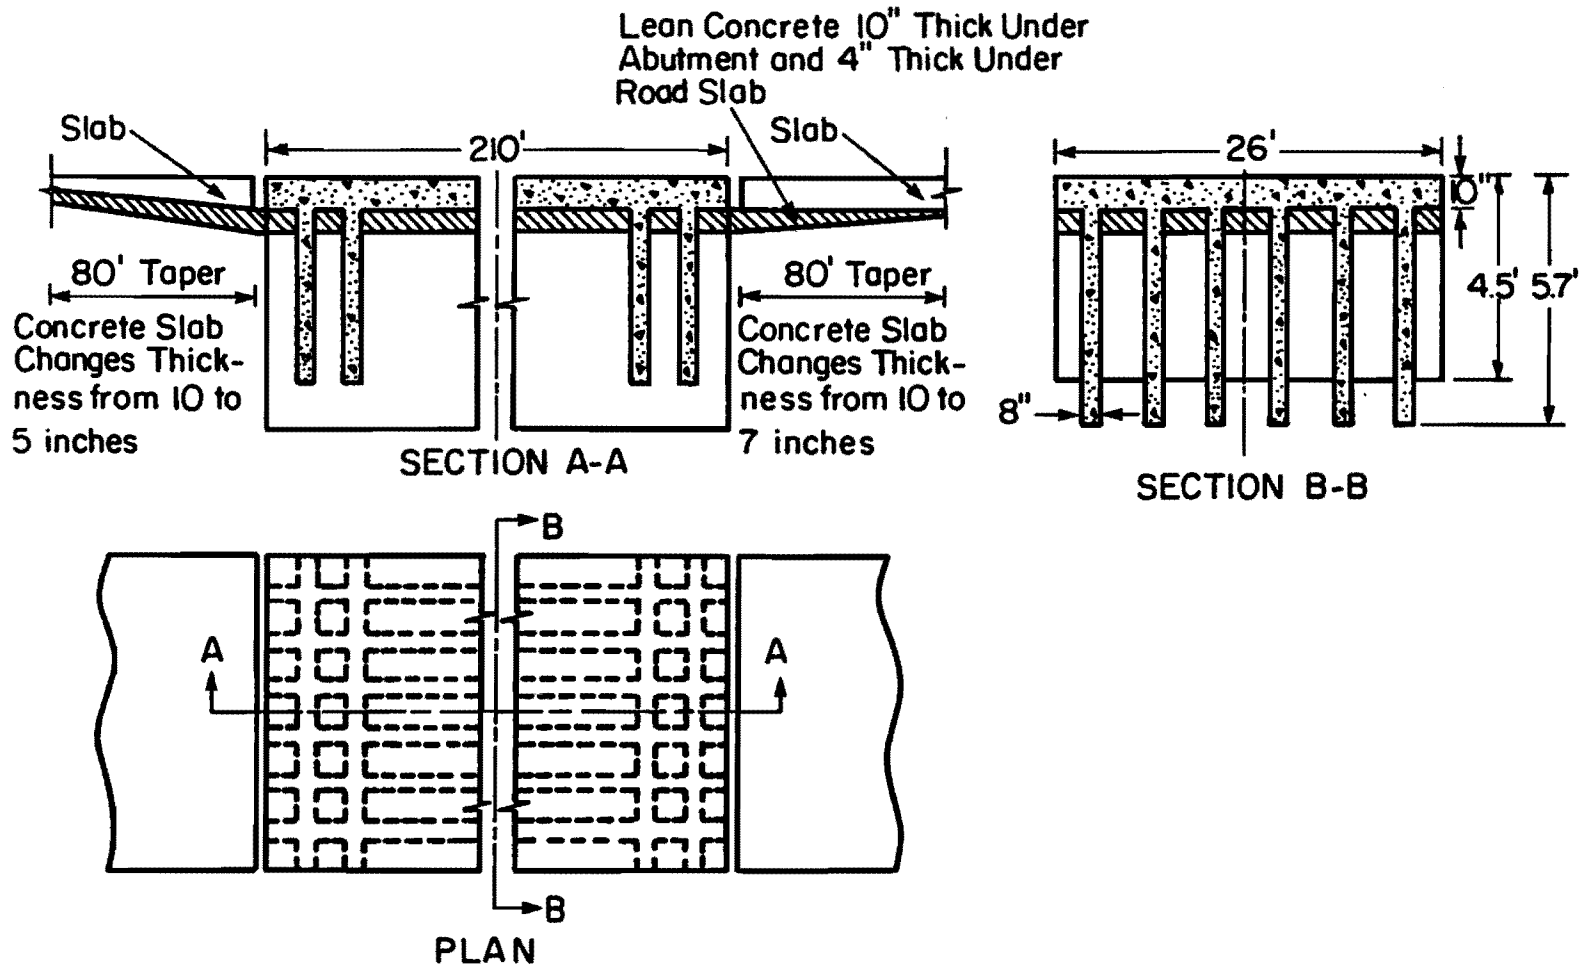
Rib soil abutment for prestressed pavement at Winthorpe, England (Ref 56).
